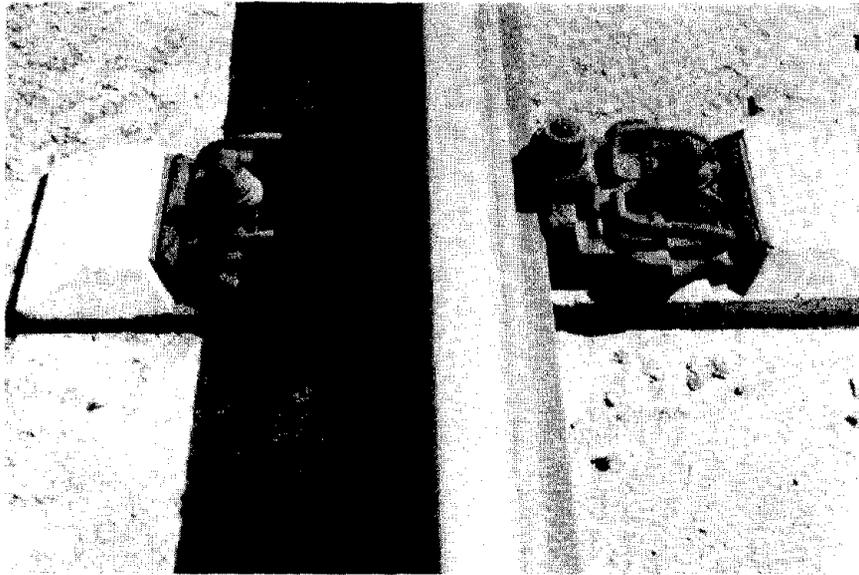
GERMAN RAILWAYS FASTENER AT
